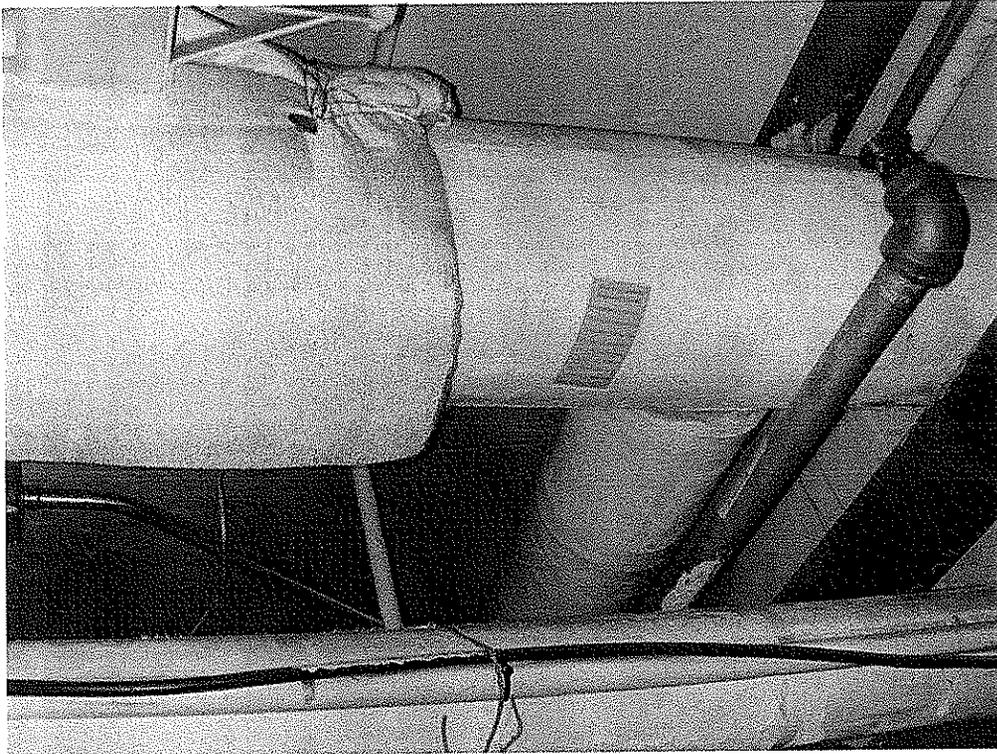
Asbestos containing thermal system insulation pipe lagging, mudded elbows and mudded hangers in basement hallways, offices, storage rooms and tunnels. The painted concrete ceiling contained lead paint.
